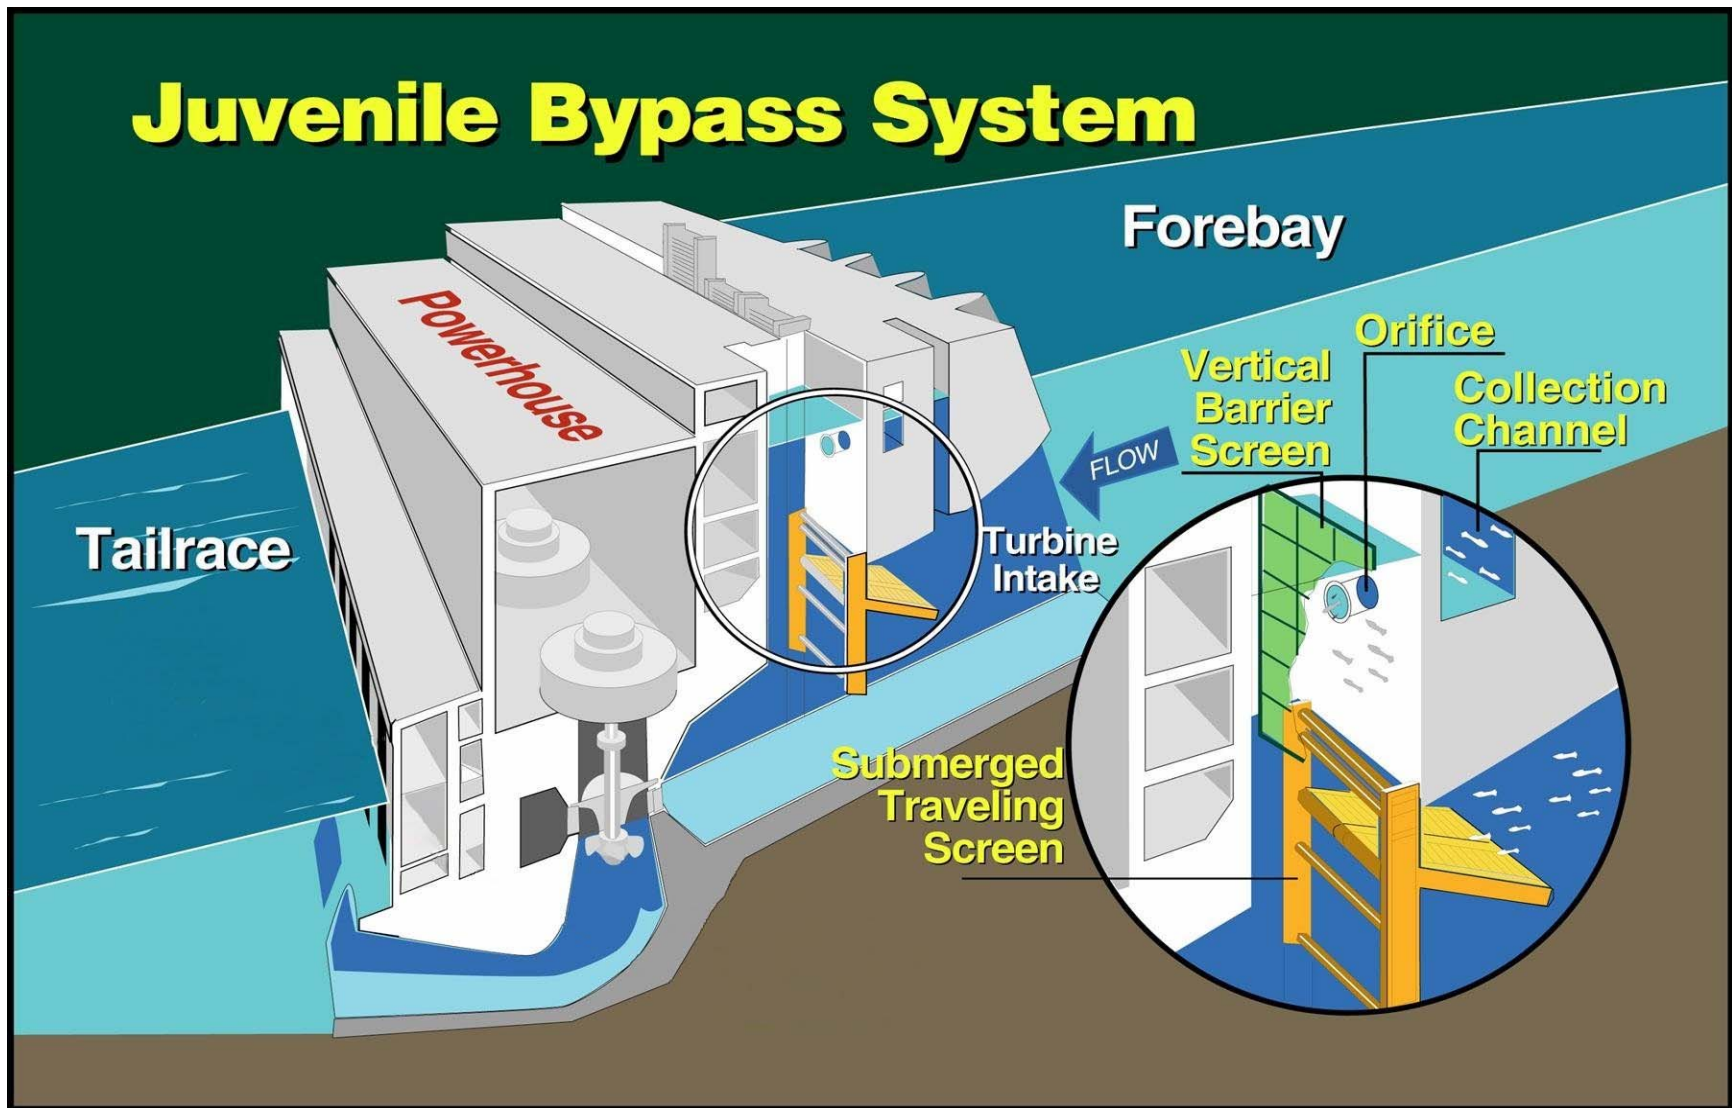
Typical Submerged Traveling Screen Bypass System in use at Bonneville and John Day Dams.
